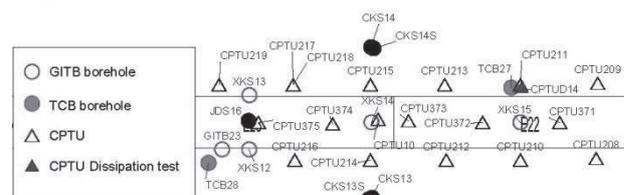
Typical arrangement of investigations along immersed tunnel alignment.
